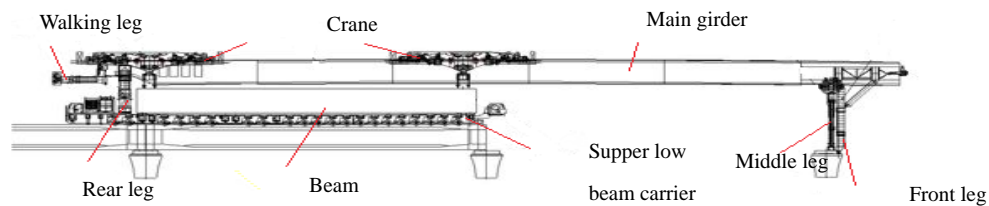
TTSJ900 bridge erector main structure diagram^[17]
